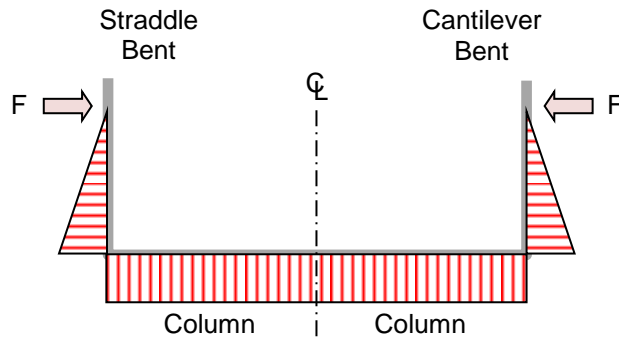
Prototype Reinforced Concrete Bridge Bents
